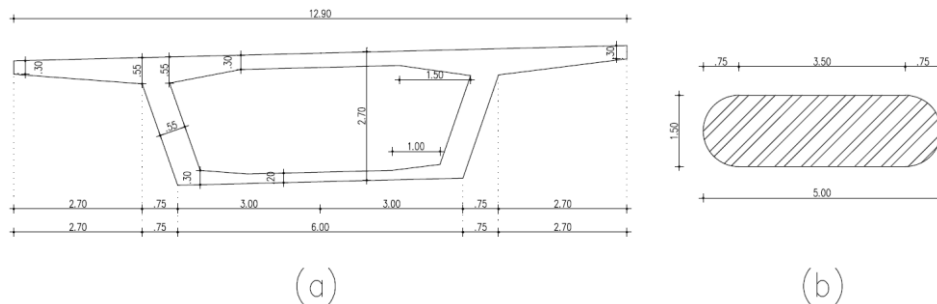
(a) Cross section of the deck at mid-span – (b) Cross section of the piers
